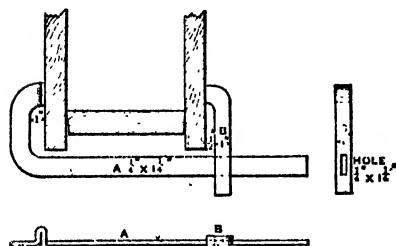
Clamp for Beam or Small Column Form. (See p. 617.)
